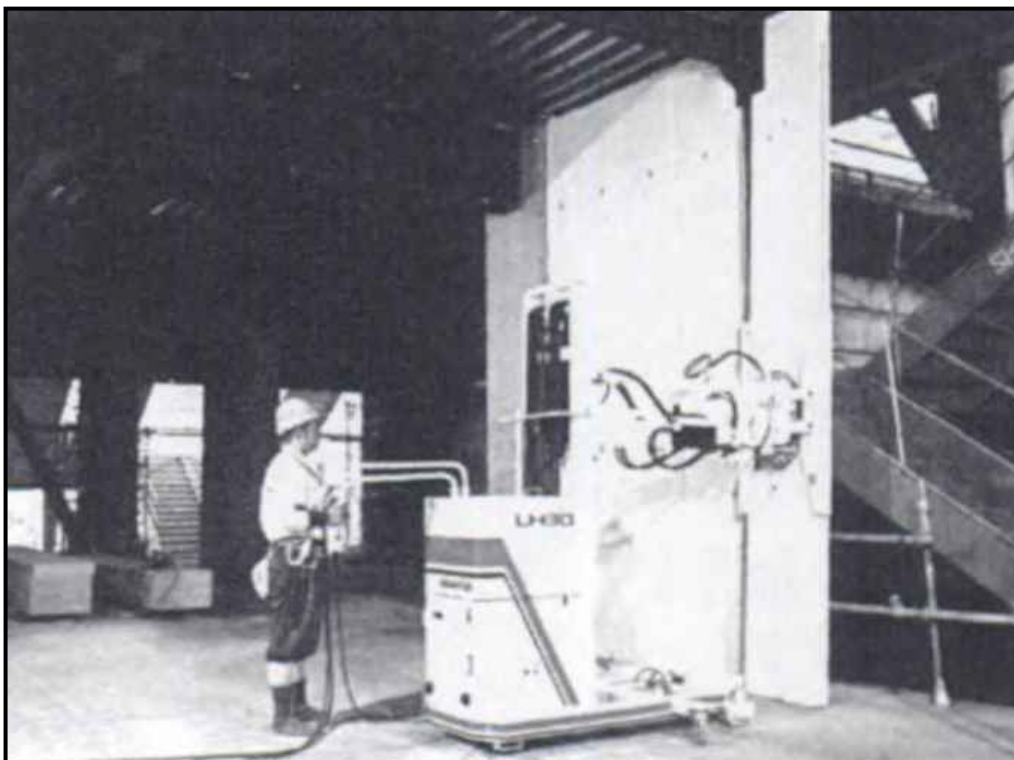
Robot Mighty Hand. *Construction Robots. The search for new building technology in Japan.
